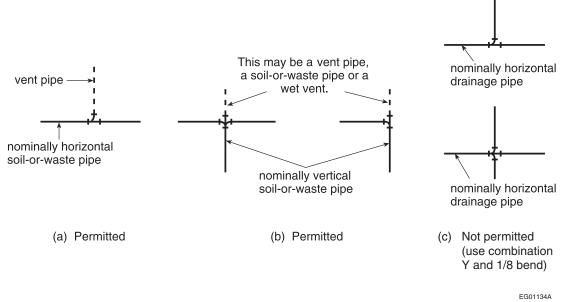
Sanitary T Fittings in Drainage Systems
